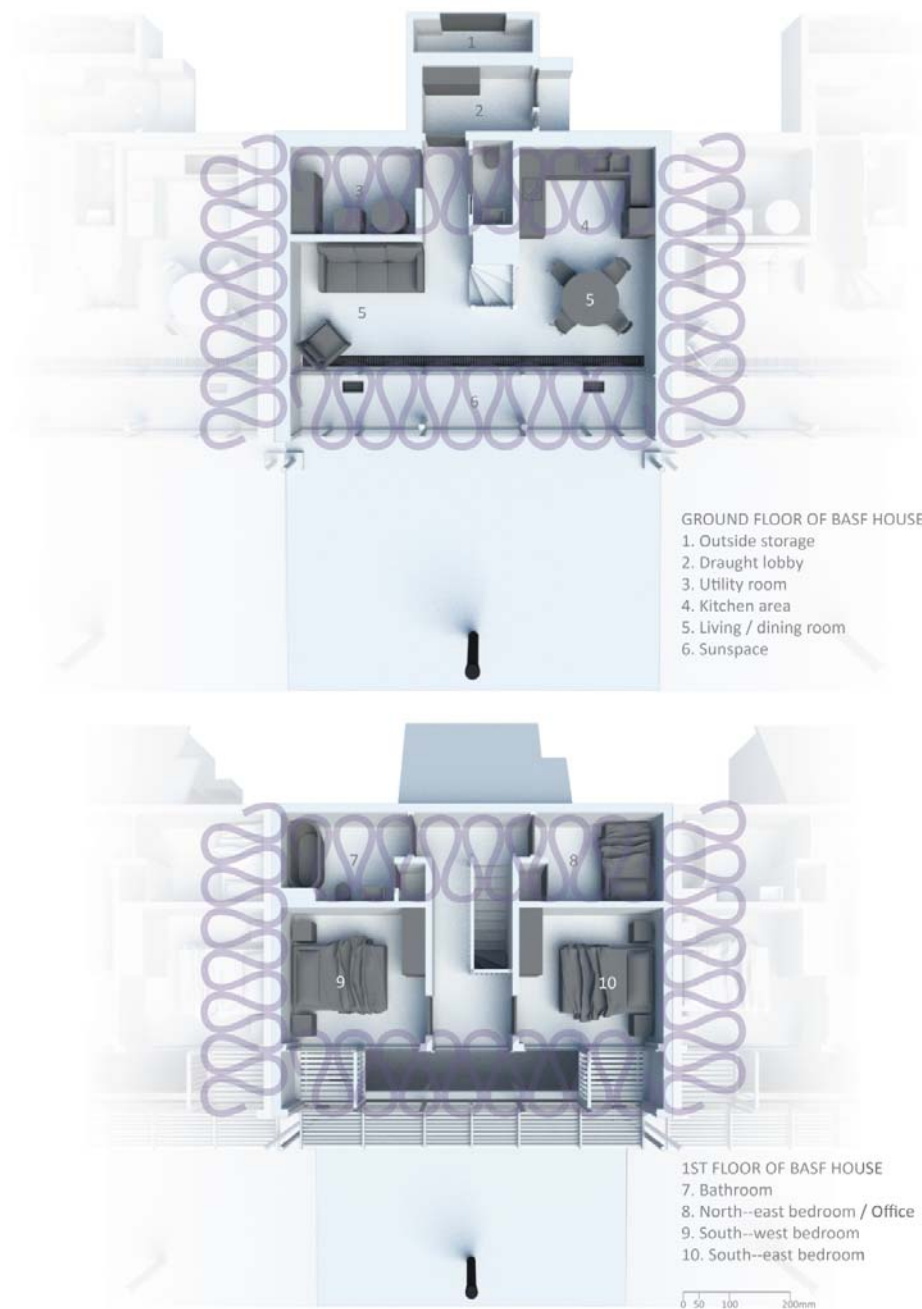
Scheme of the plan view of ground and first floors and south elevation depicting a super insulated envelope
